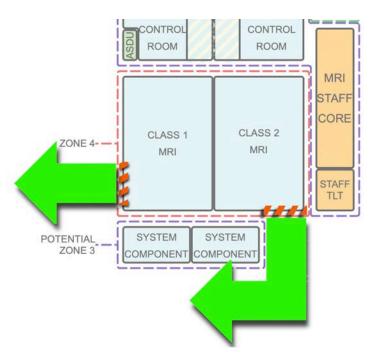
Illustration of delivery path planning. MRI (and PET/MRI) rooms must be provided with a removable 'knock-out' wall or ceiling / roof section (shown dashed orange) which will facilitate delivery or removal of the MRI device. The path of delivery through the buildings (green arrows) must be planned with minimum clear height and widths to outside the building.
